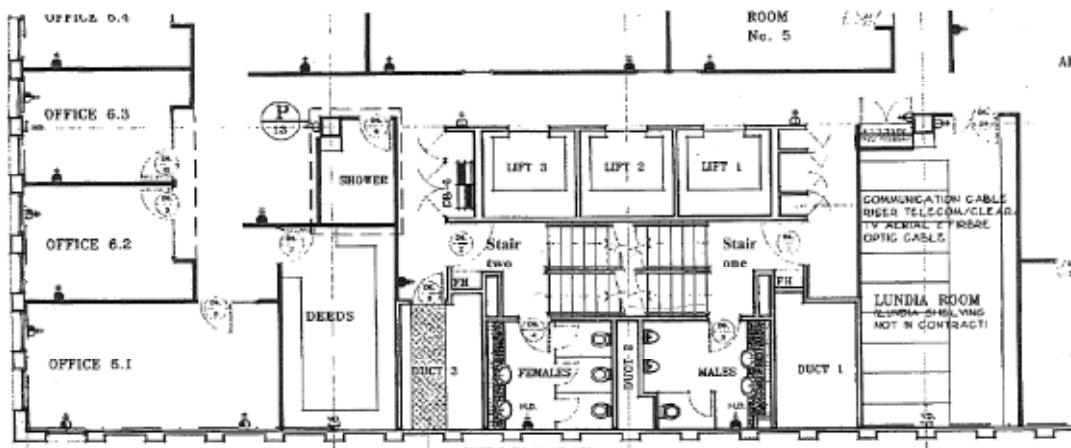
Part Floor Plan of Building in Christchurch (MacLennan, 2011)
